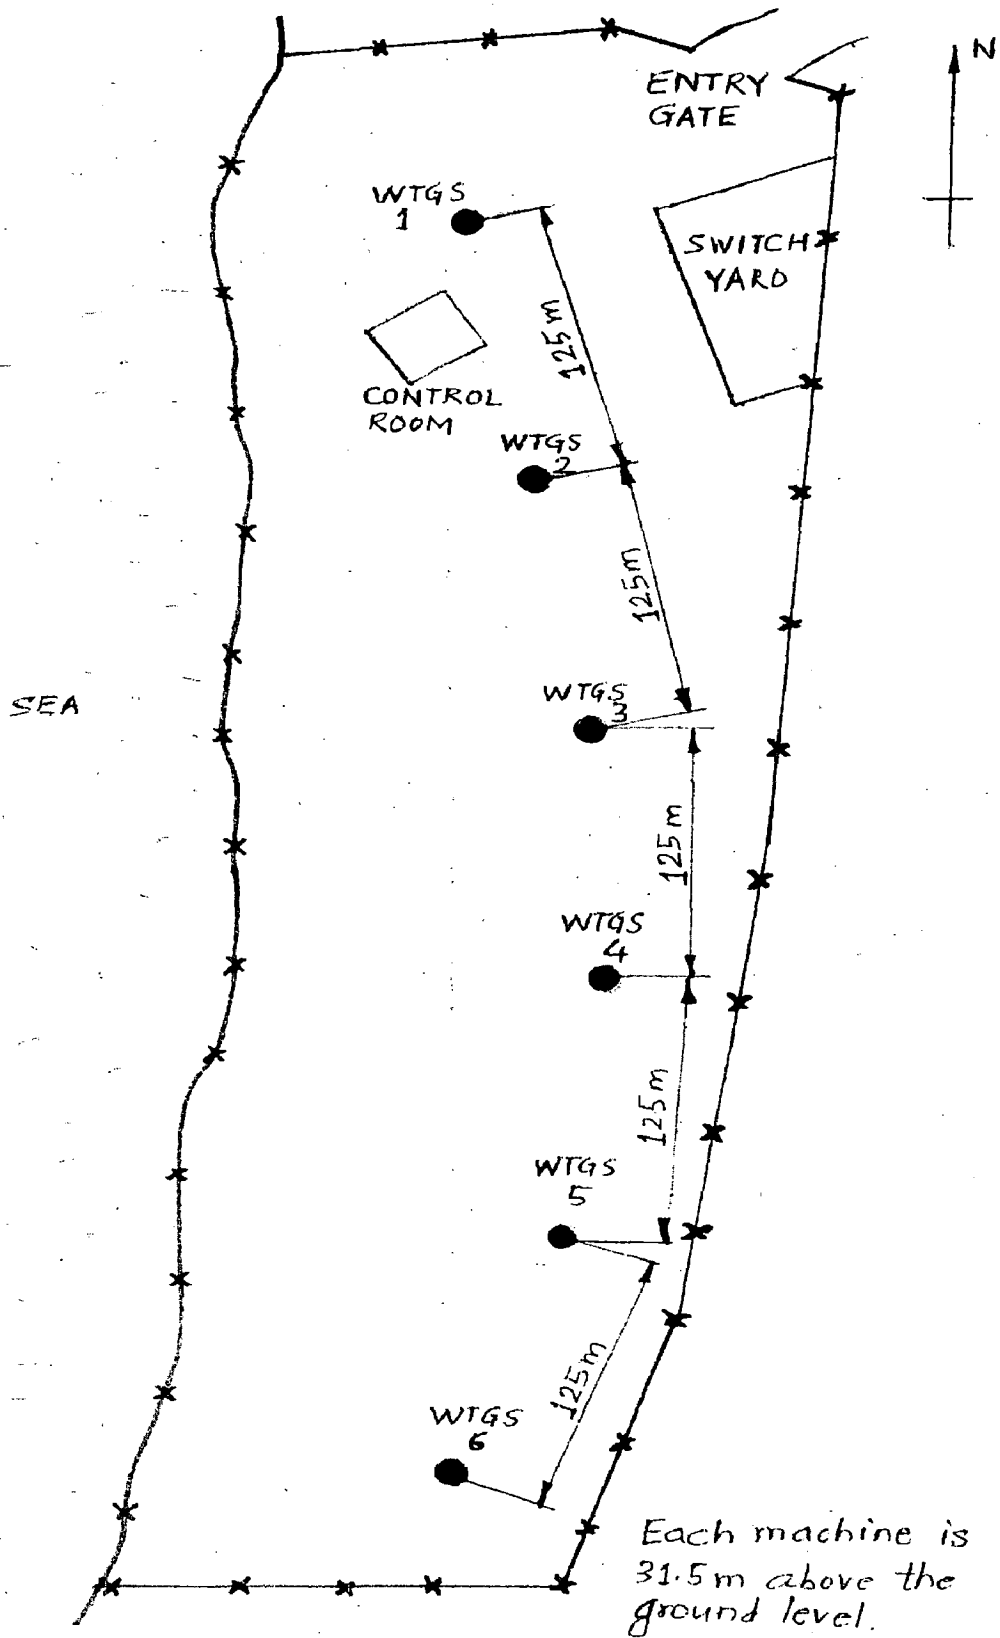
Layout of Vijaydurg - Girye wind farm
